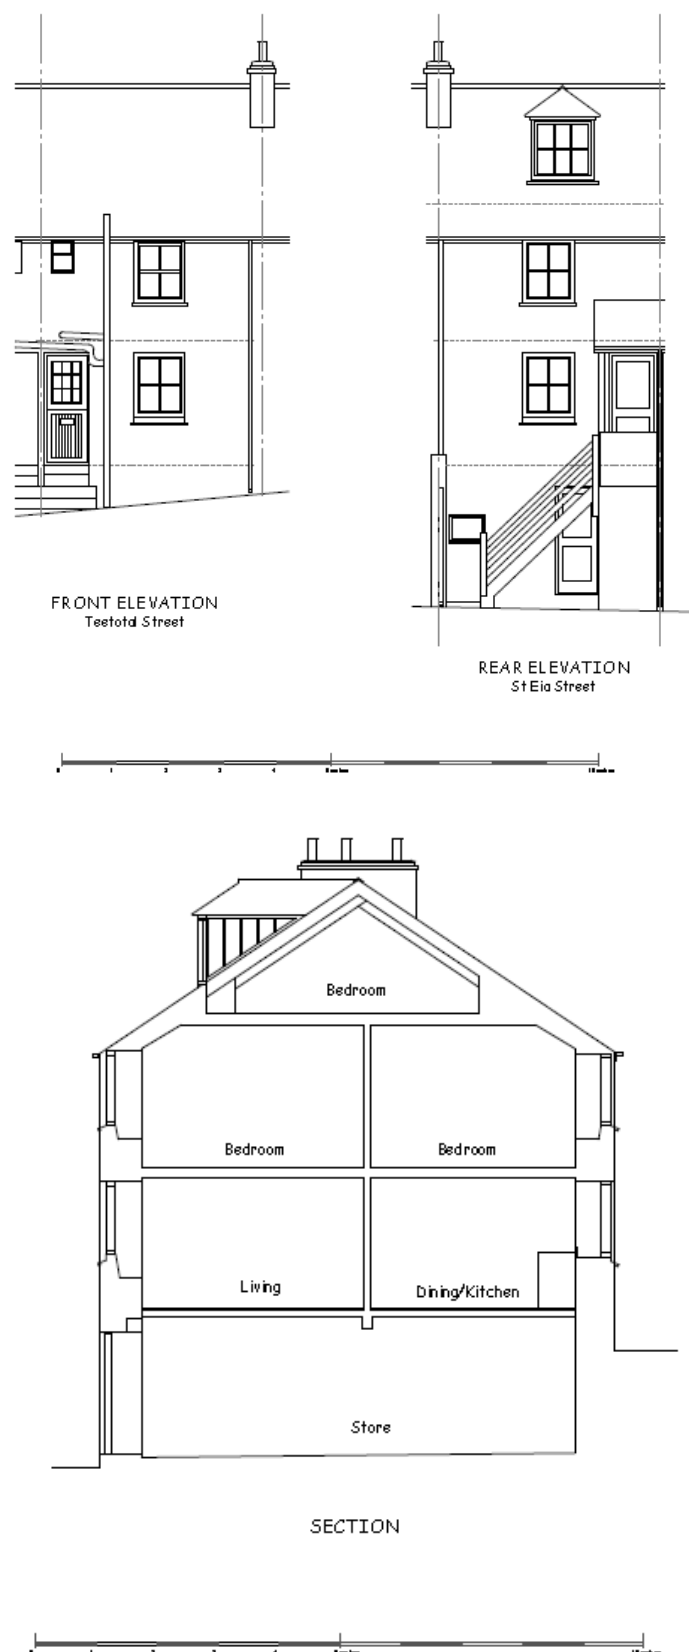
Elevations & section of 14 Teetotal St, existing (Andrew Williams, Architect, August 2011)
